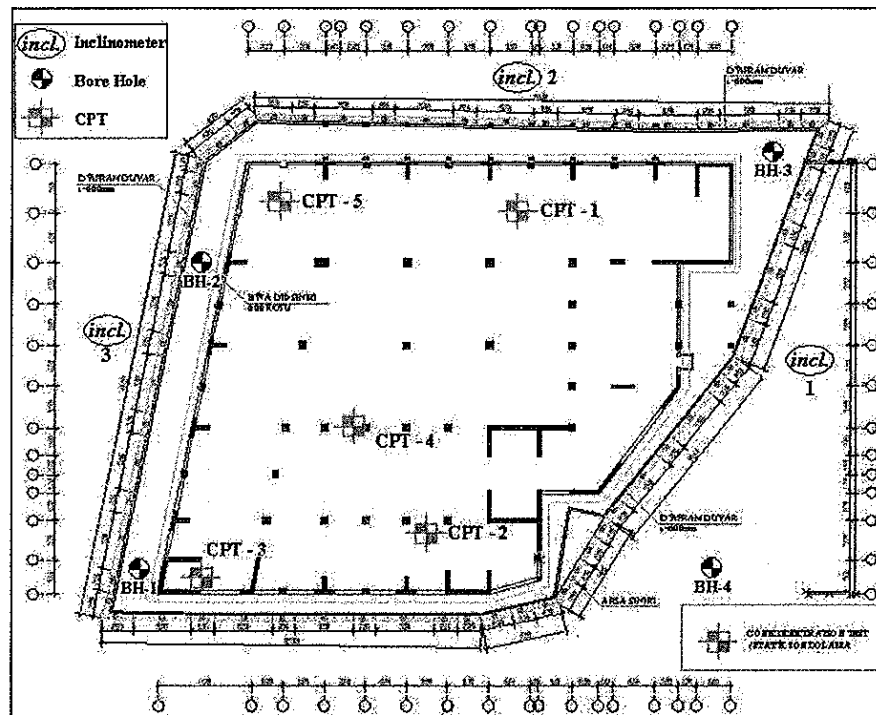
ZETAŞ – CPT / BH / INCL Investigation Site Plan
